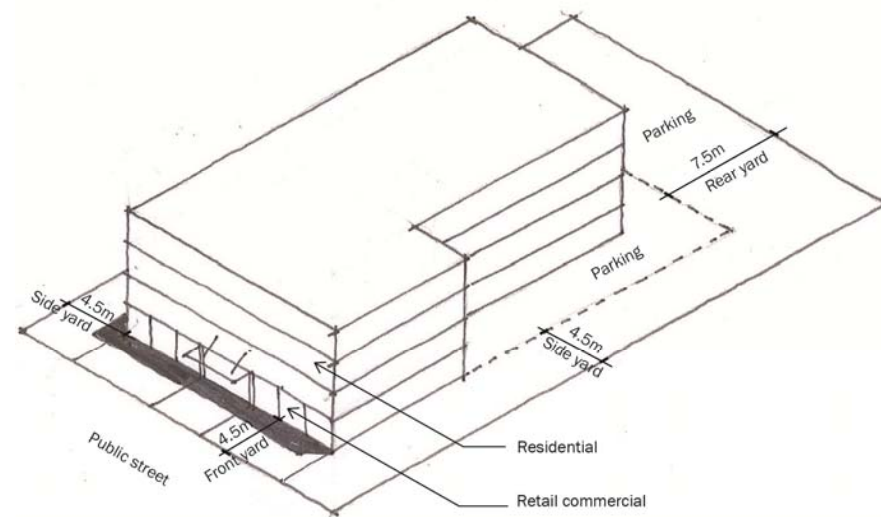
Principal Building Development Standards in the C-DTR Zone
